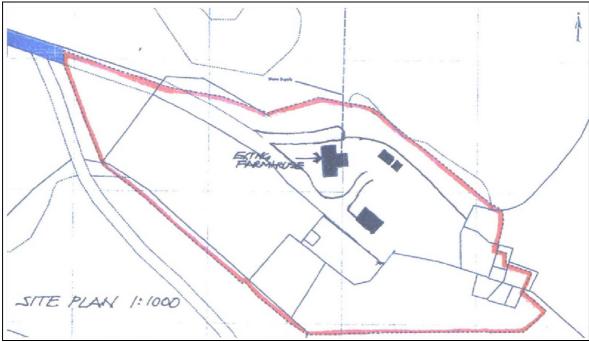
existing site plan (kindly provided by Mr Eric Baird)
